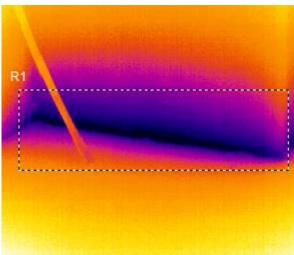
Thermal image of the basement floor at the junction of the interior walls of the 1st floor of the building.
